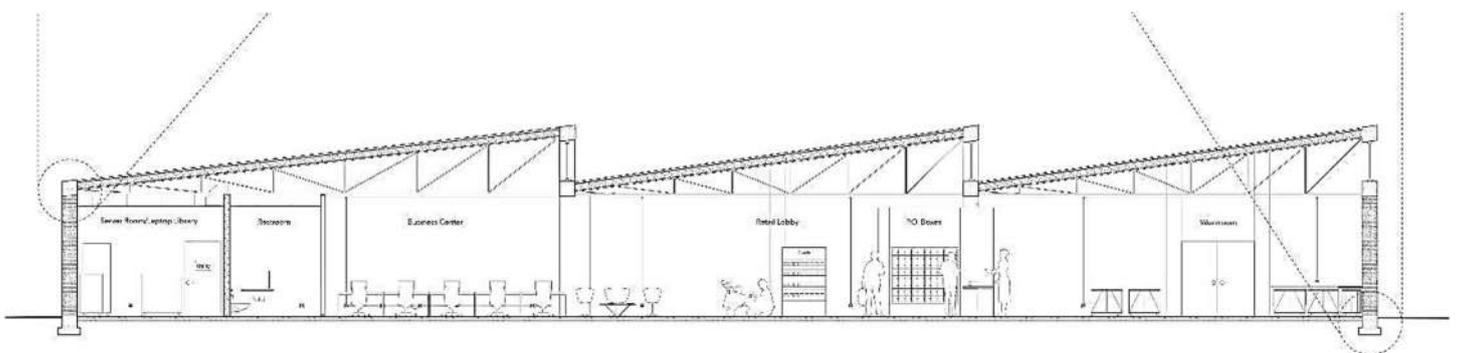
Building section drawing of post office design project in Hatch, NM by Scott Striegel, 2020. Alt text: The three main structural bays in this section drawing are formed by pitched roofs supported by steel trusses resting on adobe walls.
